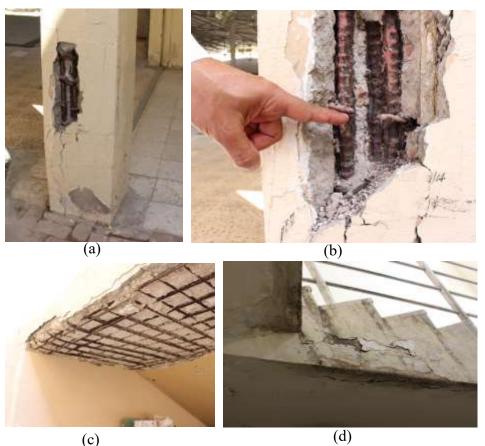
(a) Spalling of Column Concrete; (b) Rebar Corrosion; (c) Loss of soffit Concrete; (d) Spalling of Paint.
